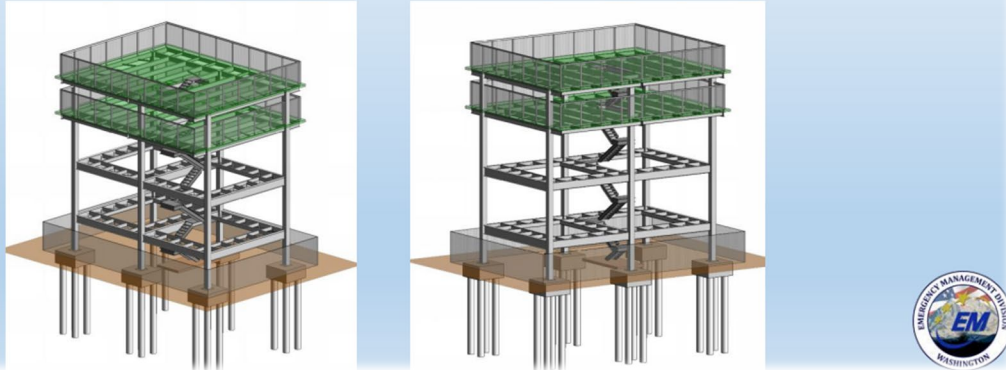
Shoalwater Bay Tribe Evacuation Tower
